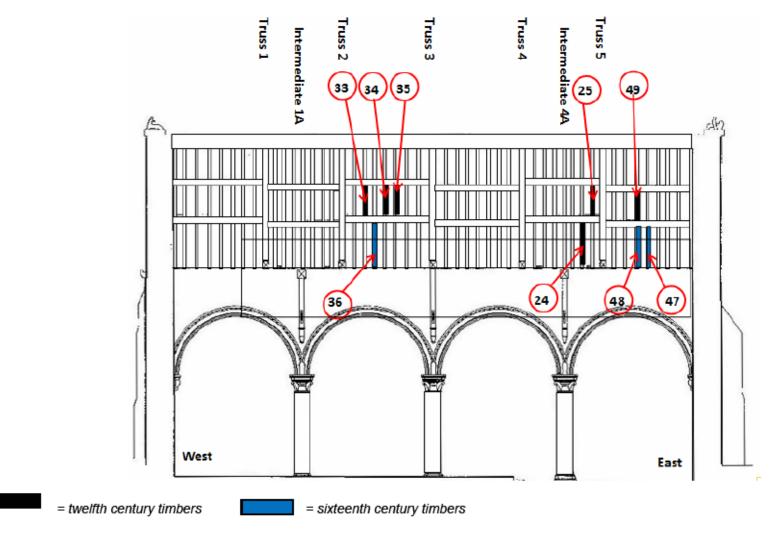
Long-section looking north to show sampled timbers (after Nick Hill)
